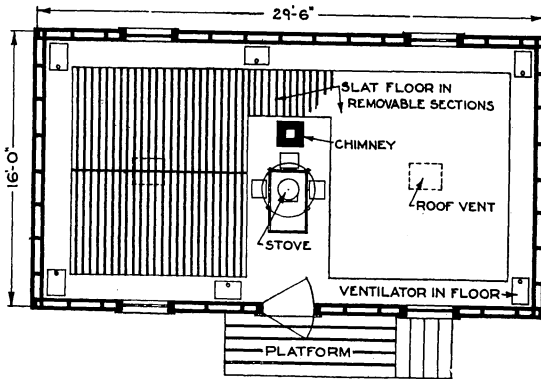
Floor plan of a sweetpotato storage house, size 16 by 29½ feet, having a capacity of about 1,000 bushels in crates, or about 1,000 to 1,200 bushels in bulk, showing arrangement of floor ventilators, roof vents, chimney, and other structural details.
